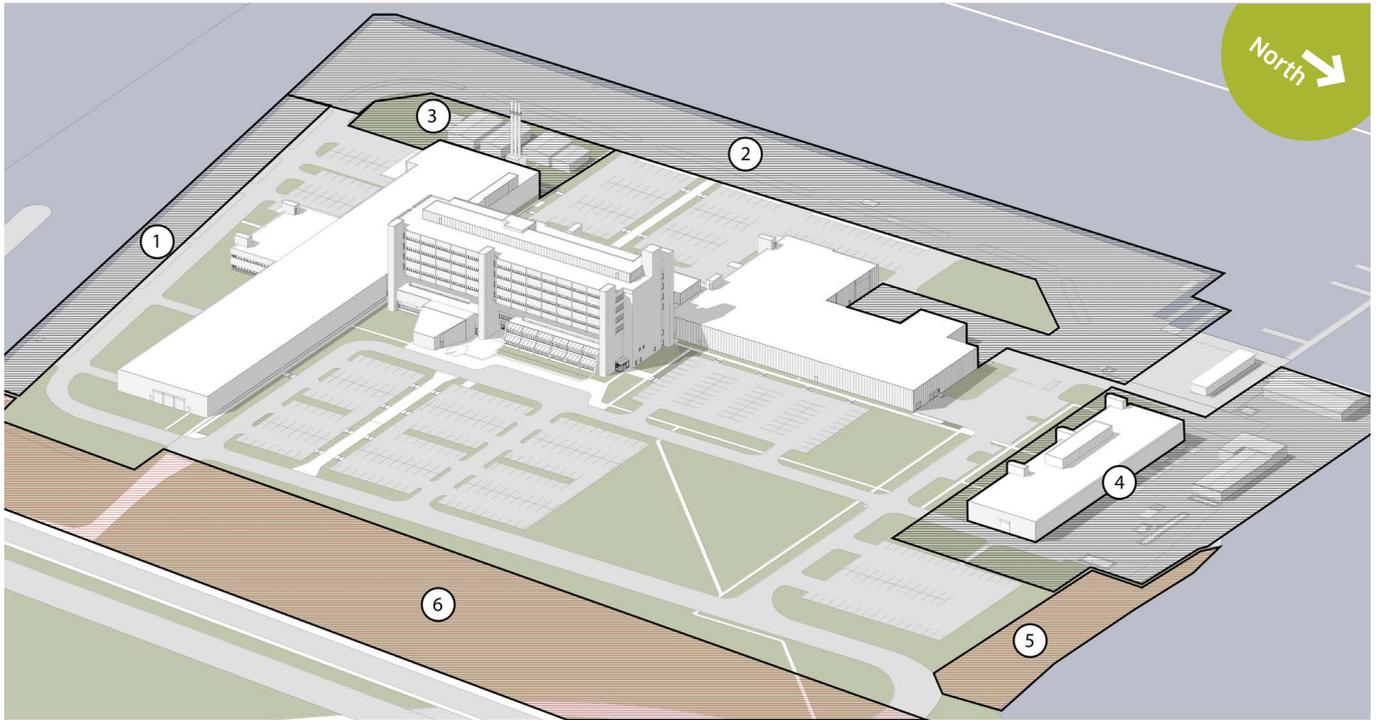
Canada Centre for Inland Waters Axonometric - Building Siting Constraints
